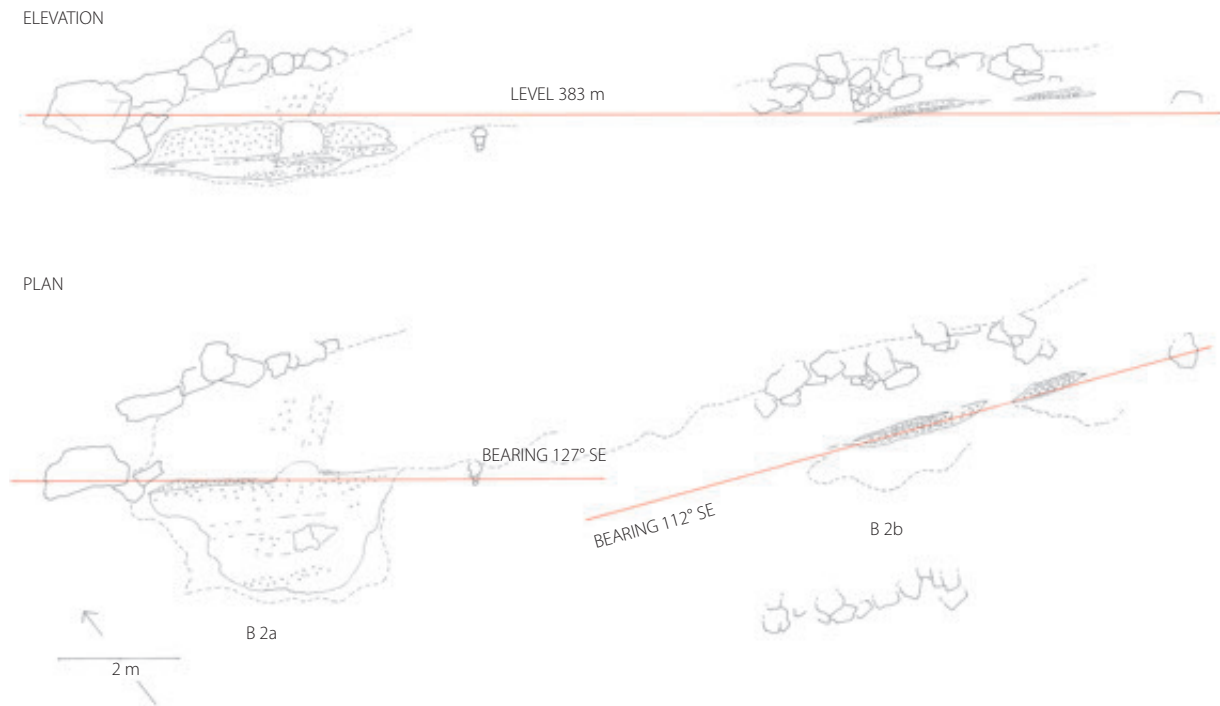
Areas B2a and B2b, elevation and plan of the hewing of a larger area of rock with a protecting arrangement of stones laid on top. Scale 1:150. The horizontal red line in the elevation shows Level 383. In the plan the red line shows the compass direction 127° SE in 2a and 112° SE in 2b. The sketch shows the bisected area. The course displays a presumed turning of the road.
